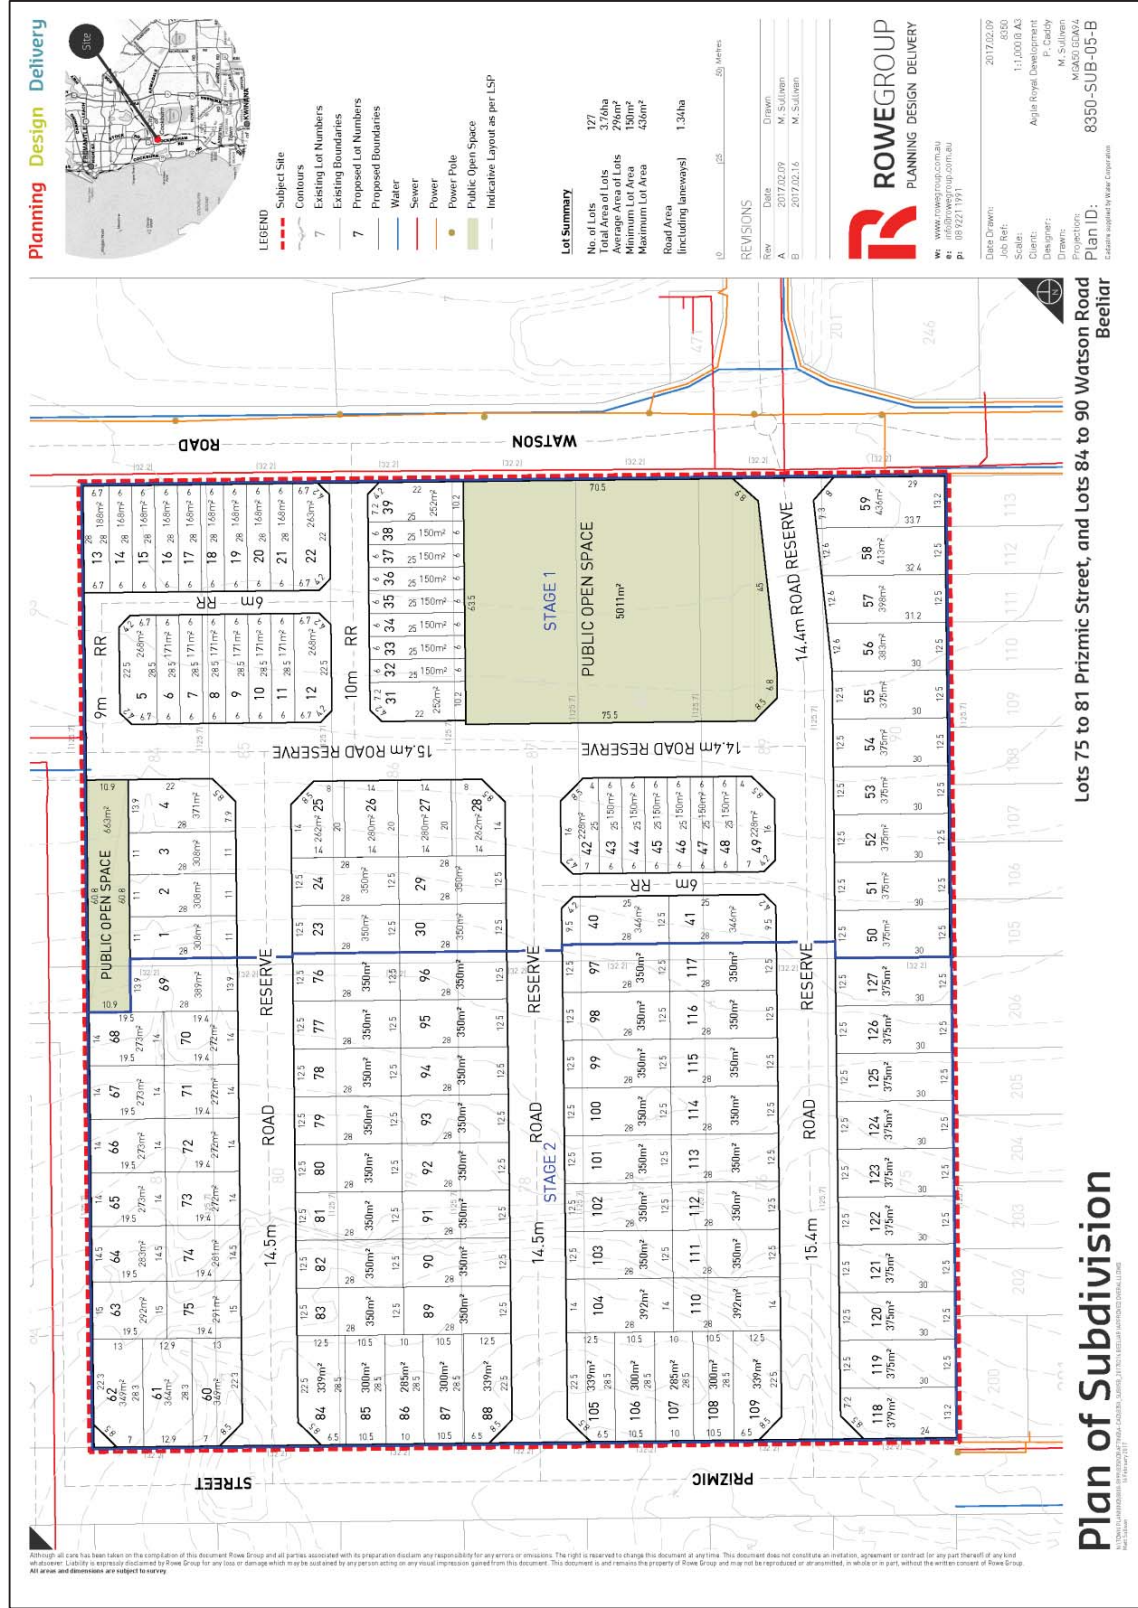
Proposed subdivision site plan (Source: Rowe Group)
